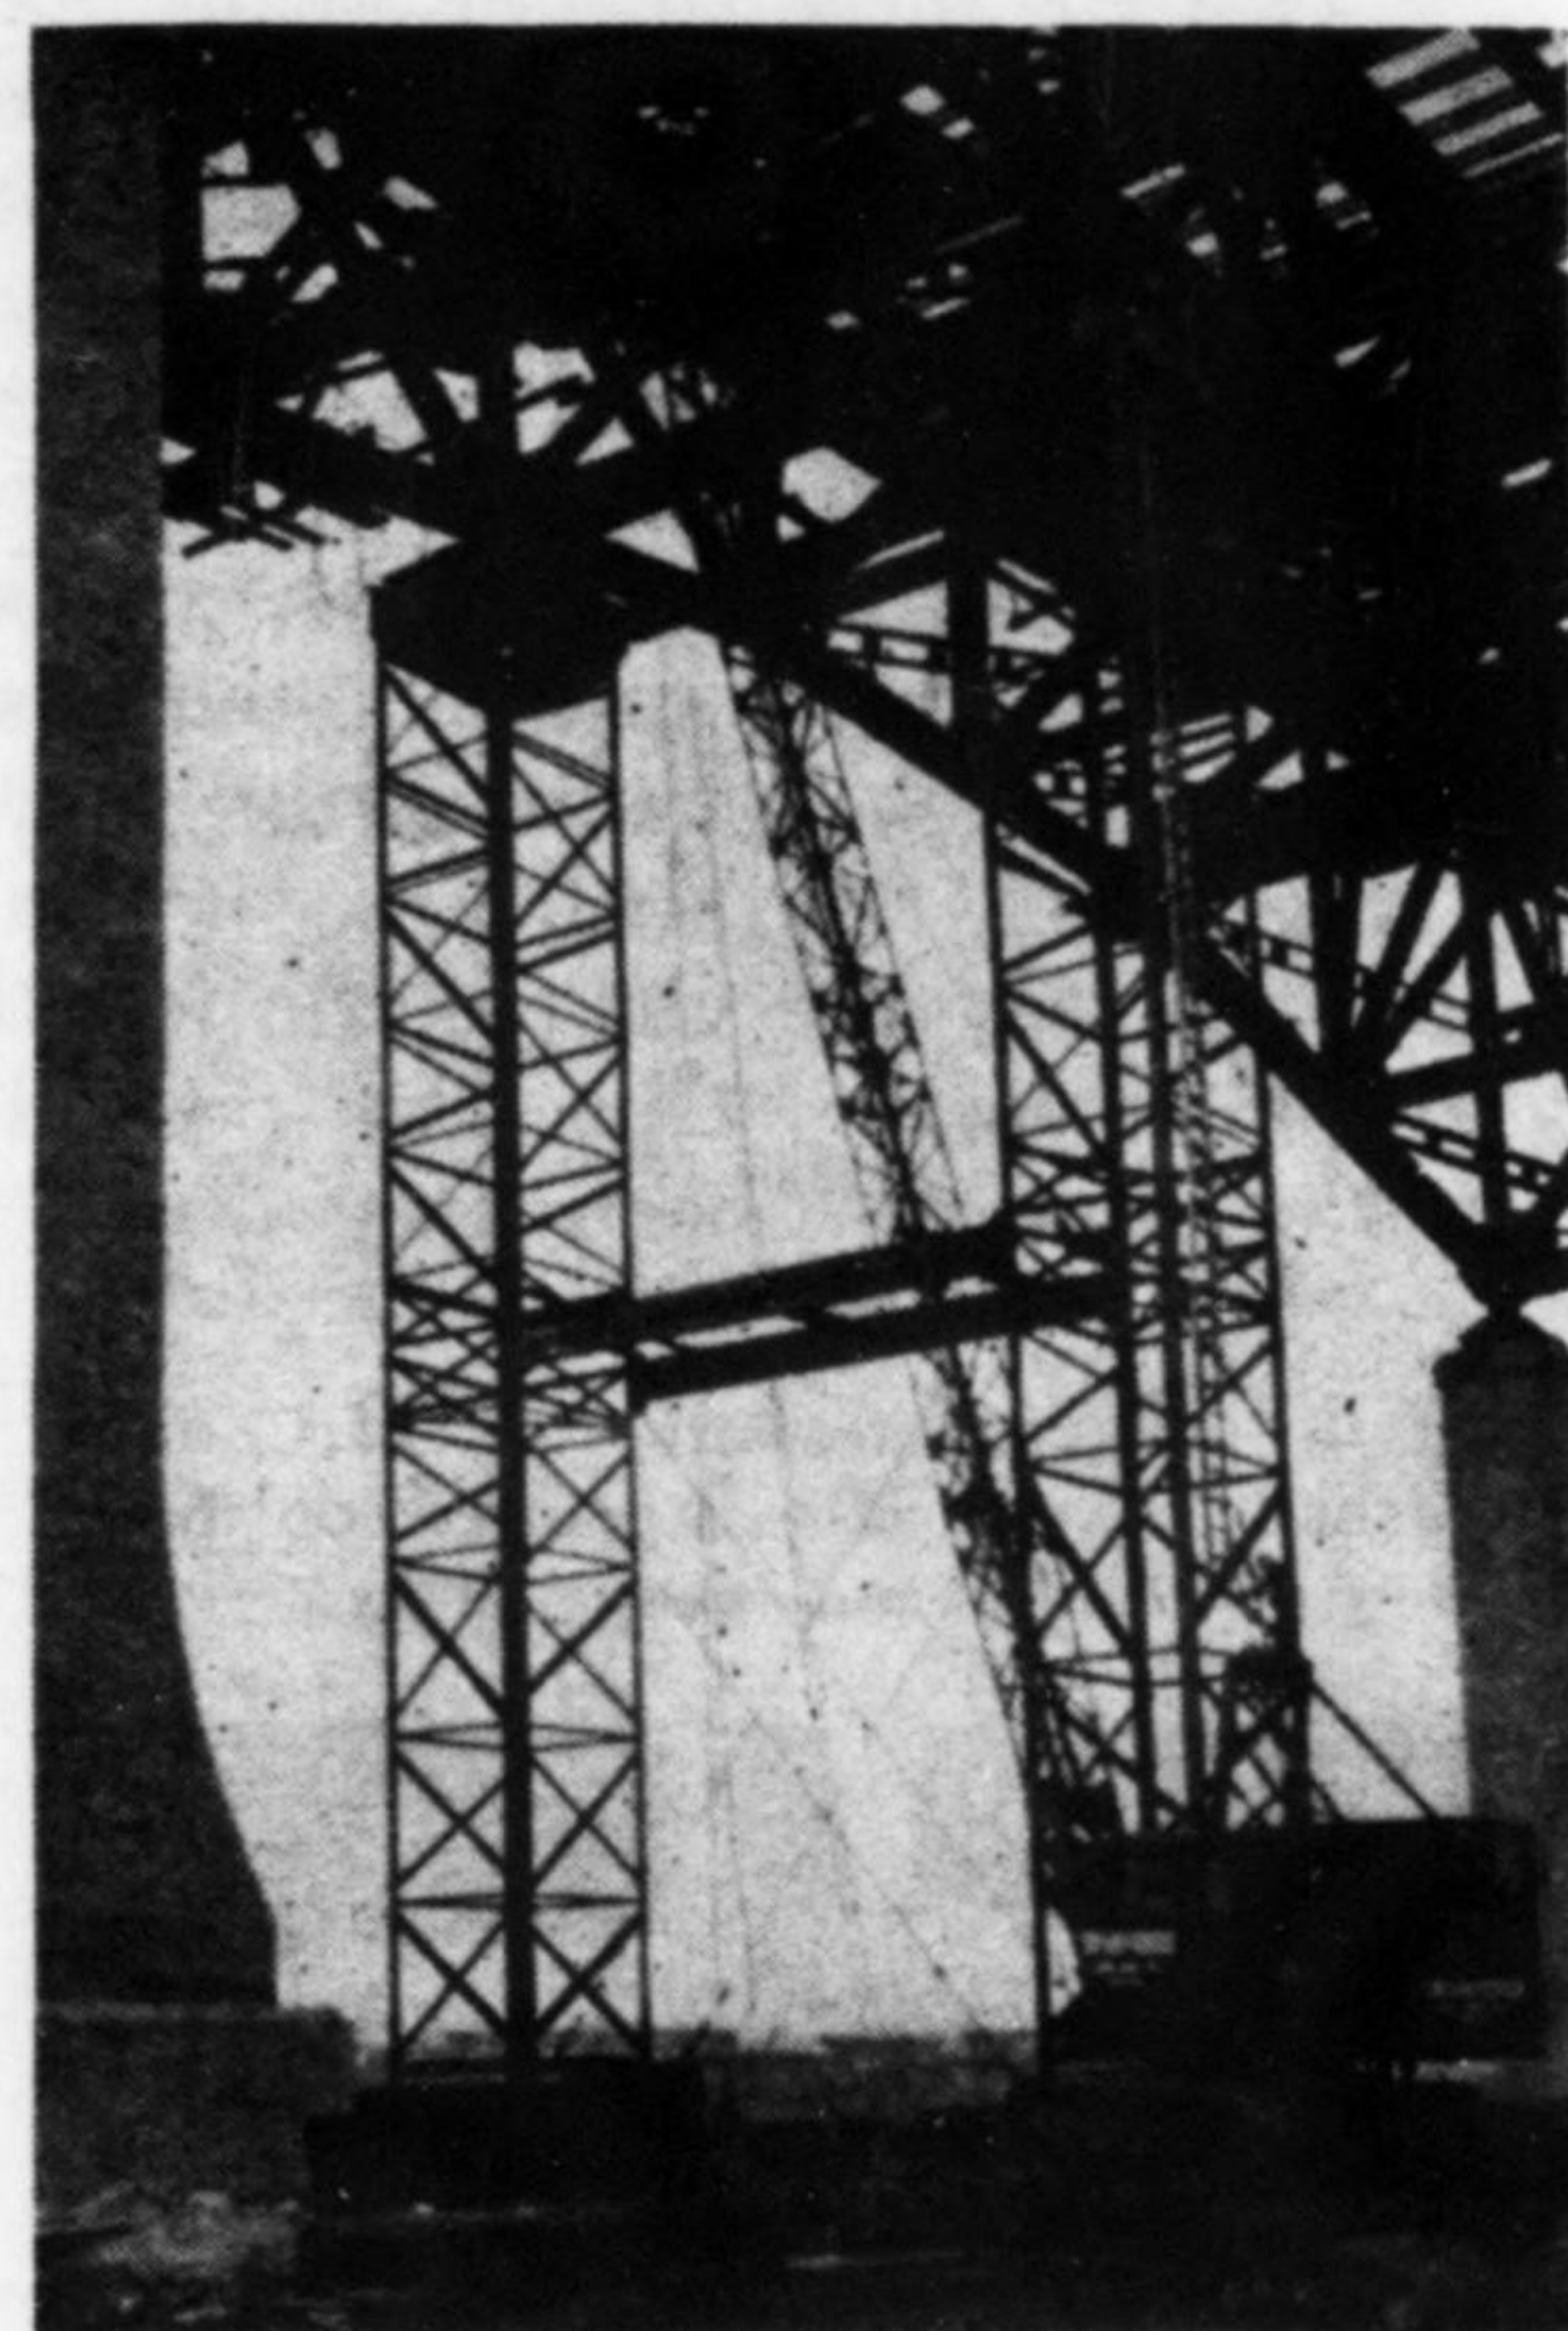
Steel tower falsework, one bent per span, set by crawler cranes that also erected the lower members in the viaduct trusses, was used on the Taylor-Fichter section.
